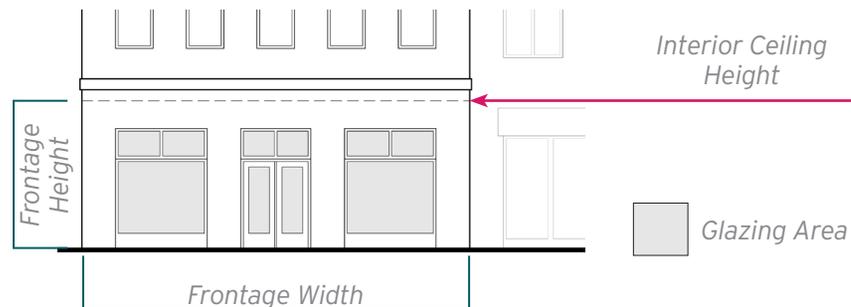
Minimum Frontage Glazing Conceptual Diagram
